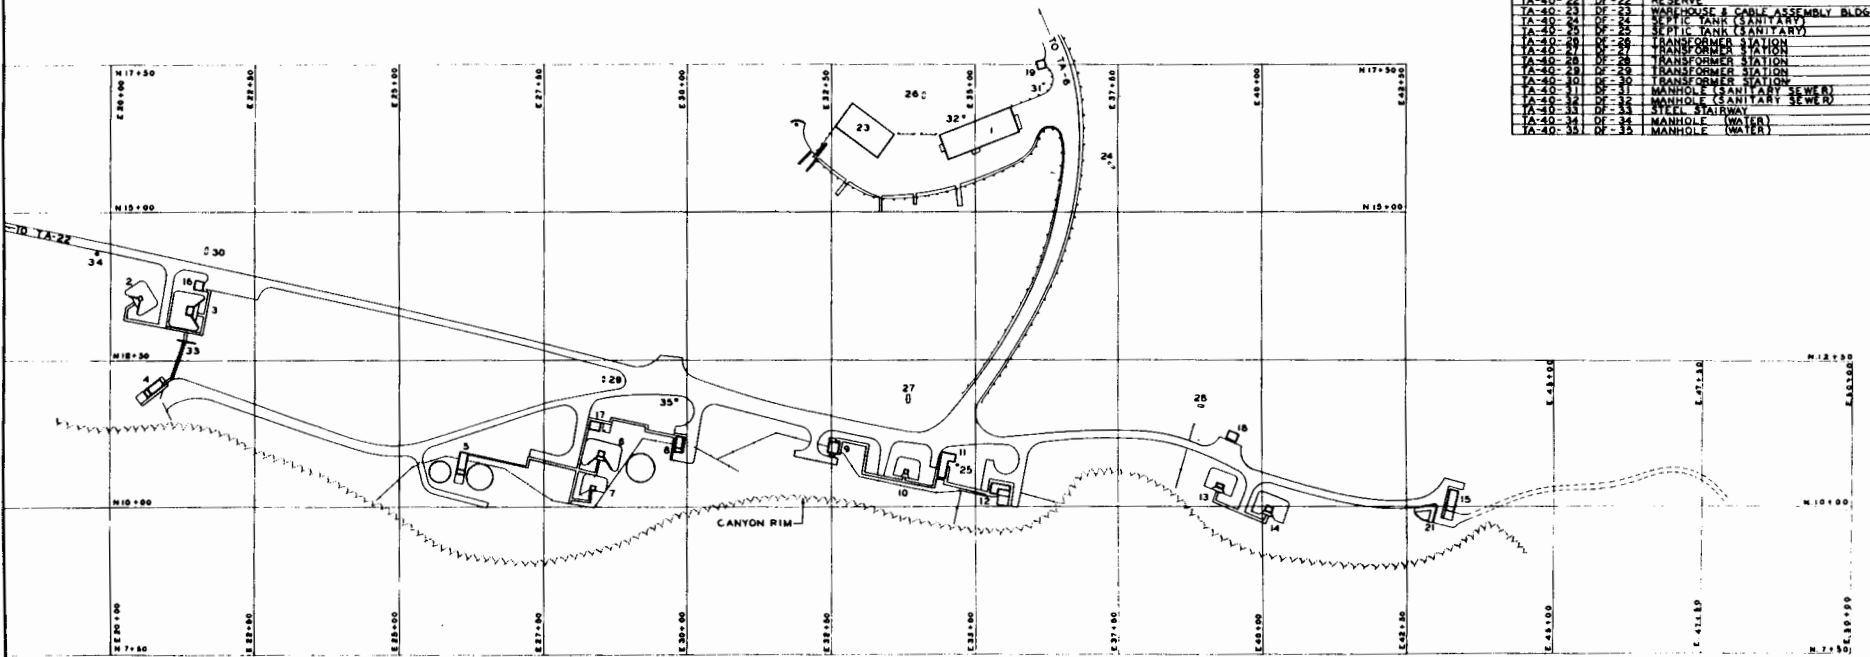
Structure Location Plan for TA-40 - Detonator Firing Site (1954 Drawing from the LANL Technical Area Structure Location Plans)
